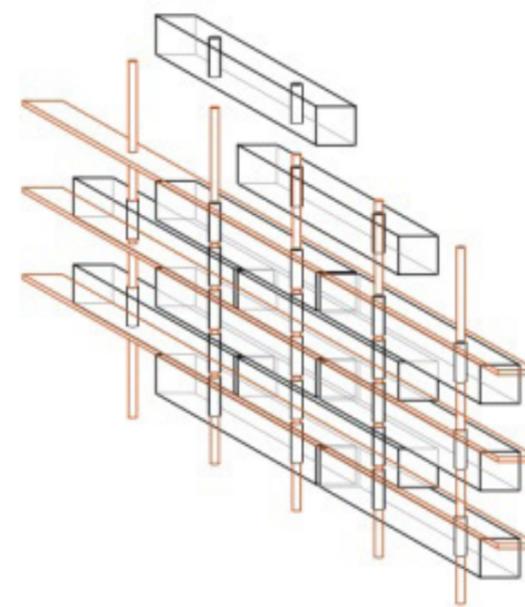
a Optical House facade illustration showing the substructure (F. Oikonomopoulou, T. Bristogianni, et al., Interlocking cast glass components, Exploring a demountable dry-assembly structural glass system 2018)
